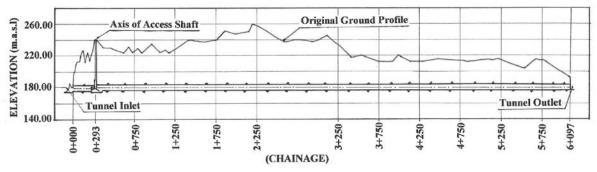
The longitudinal section of Dasht-e-Abbas tunnel [9]
